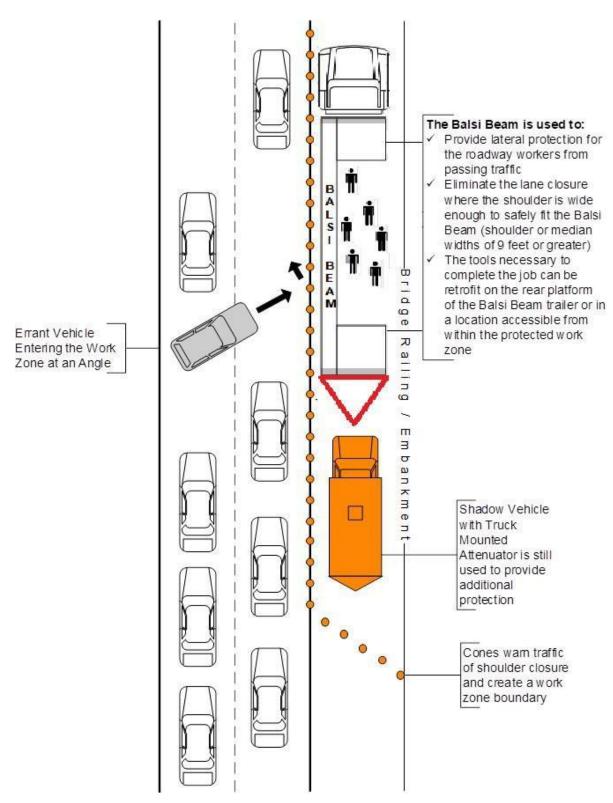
Balsi Beam used in the first lane or the shoulder of the road. Balsi Beam protects the crew by having two steel beams set between the traffic passing by and the work zone. TMA is parked behind the Balsi Beam for additional protection.
